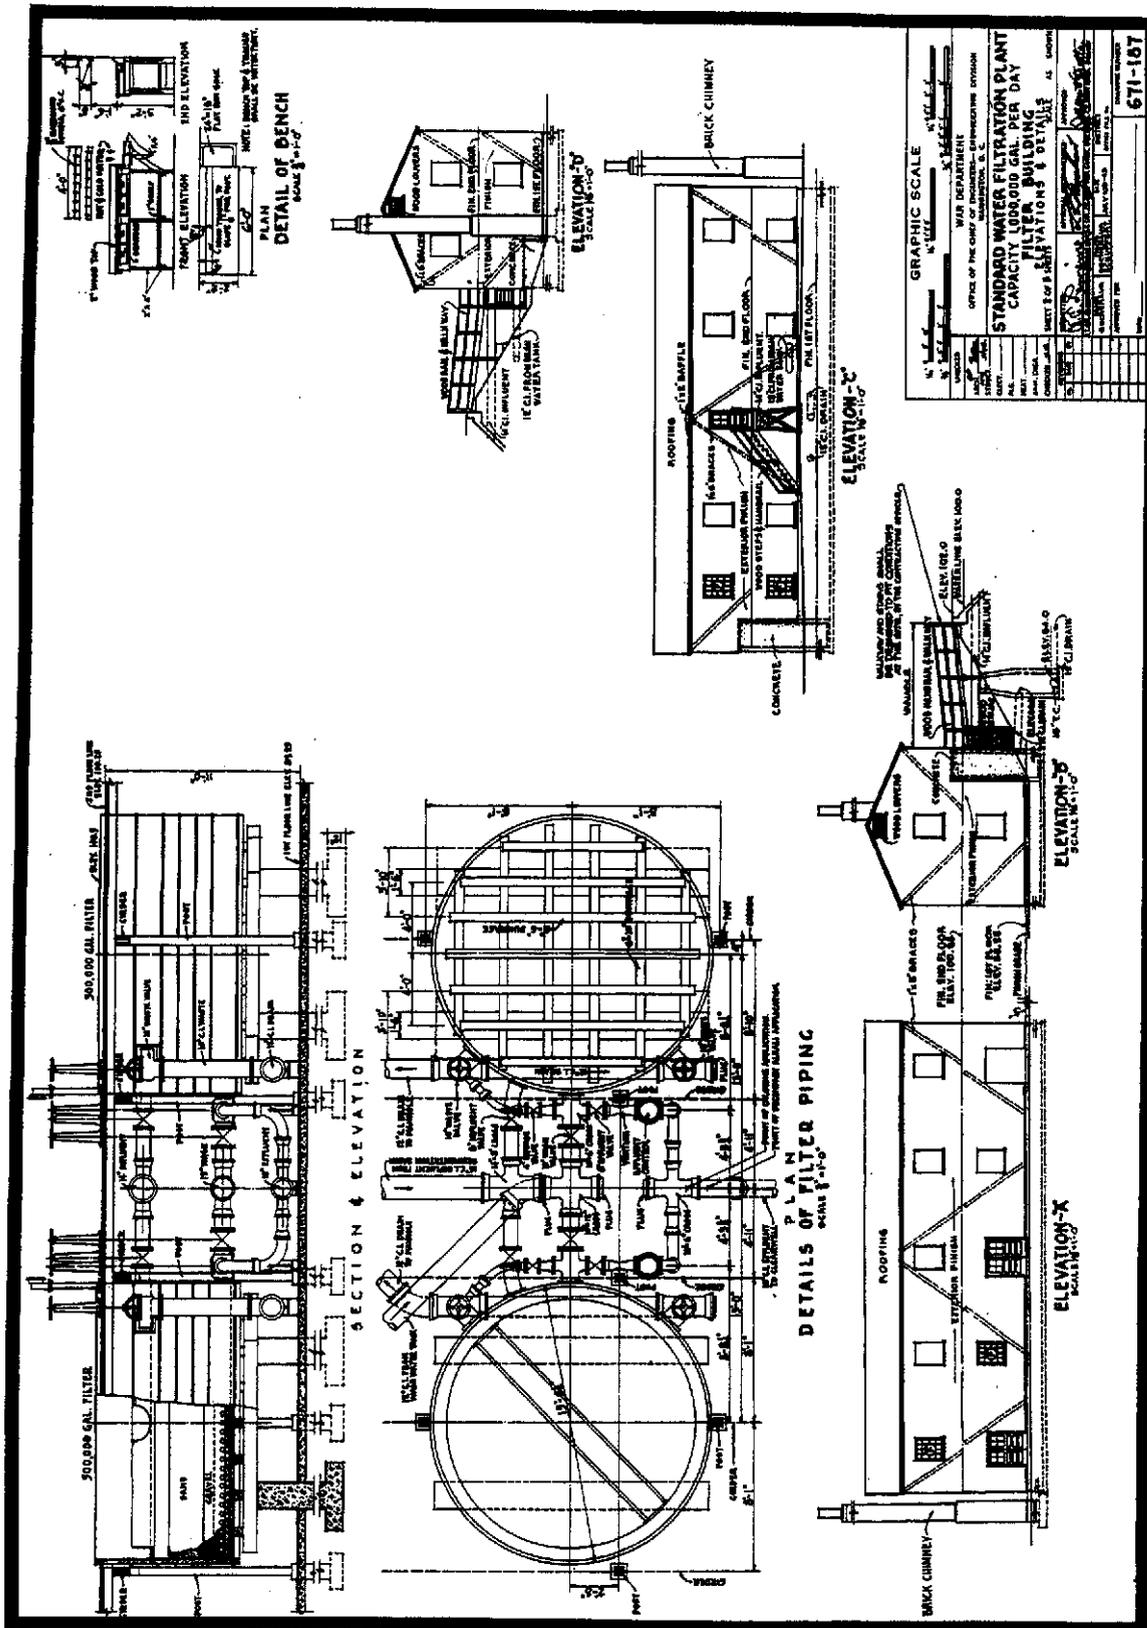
1943 standard water filtration plant (History Office, U.S. Army Corps of Engineers, OQMG Plan 671-187, Box 115)
